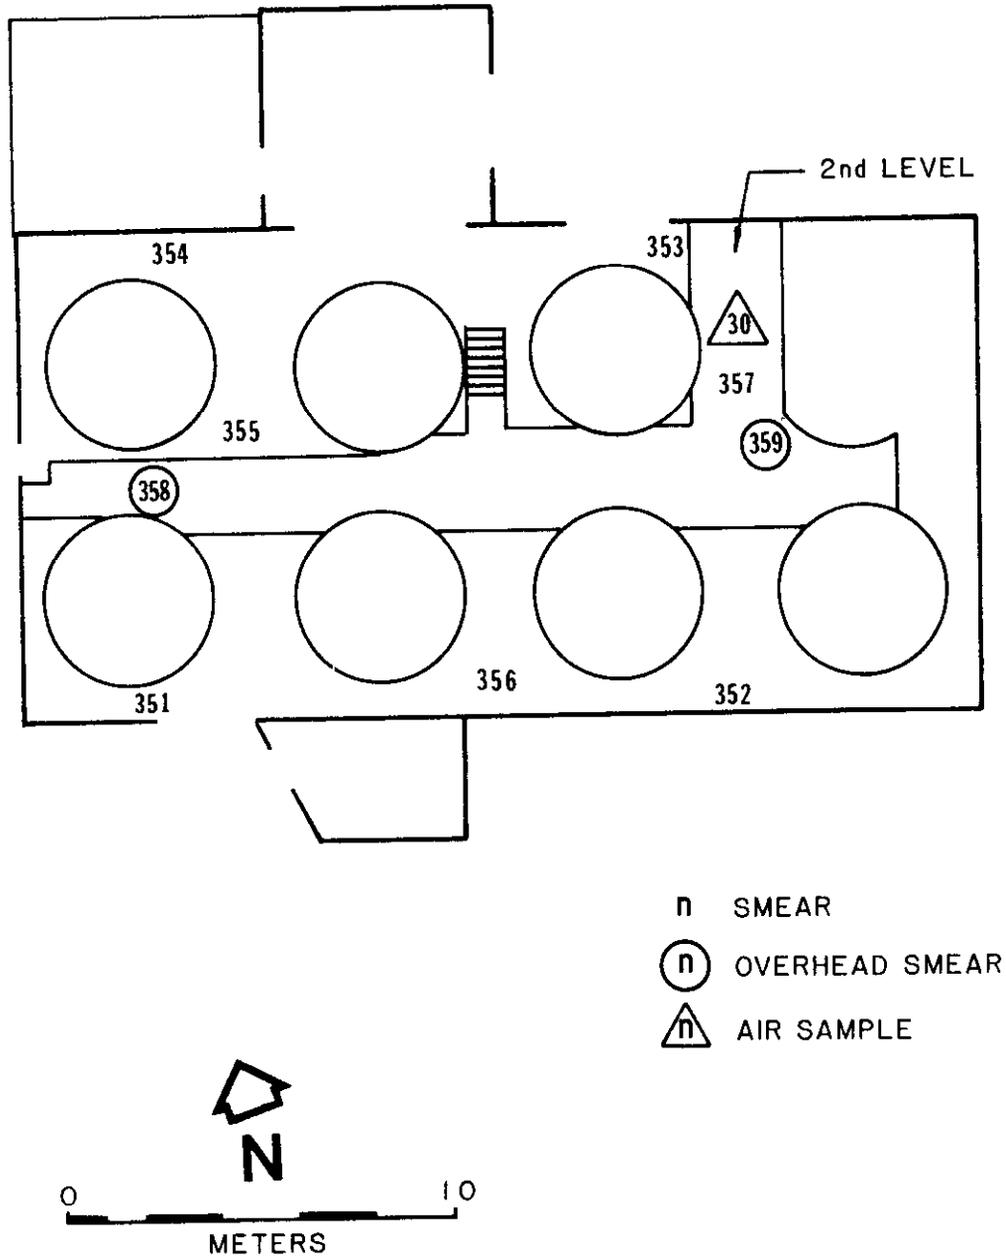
Building M-2 Ground Floor and 2nd Level Survey Locations.
